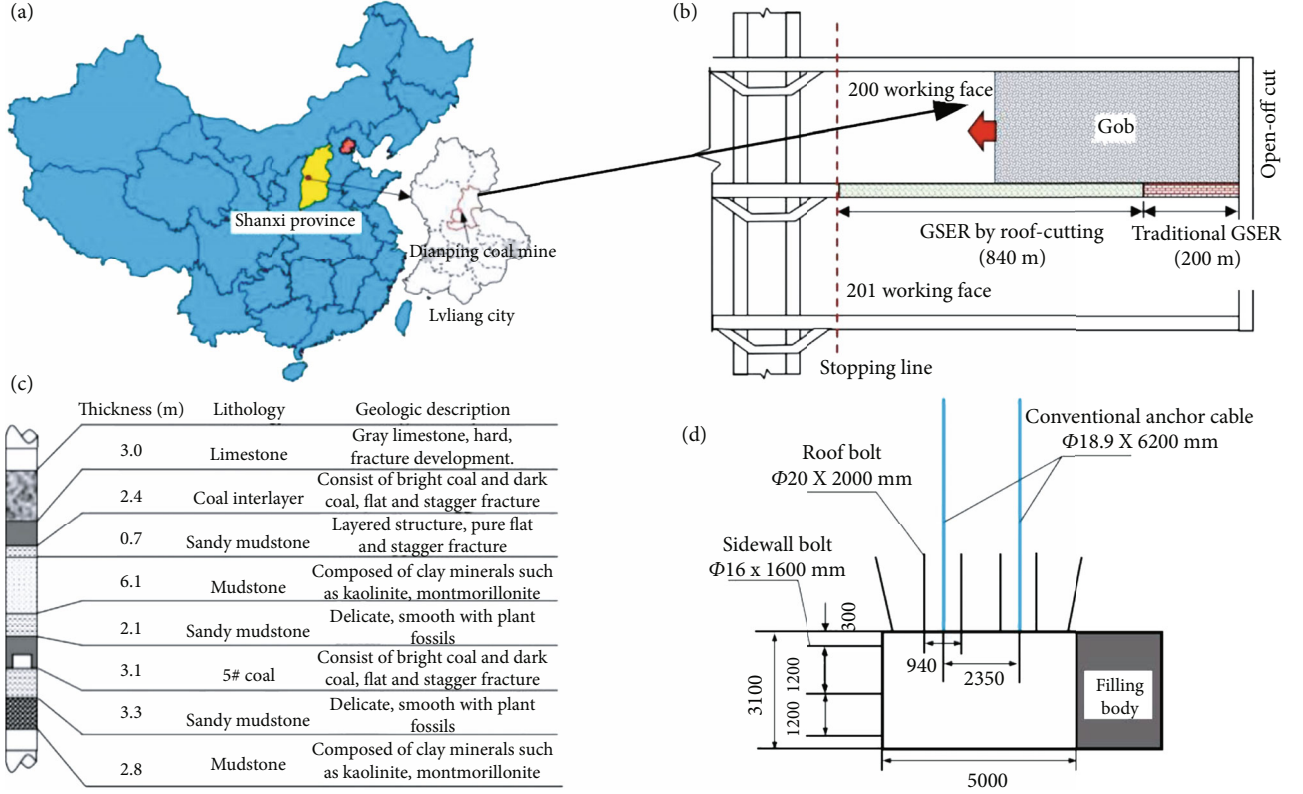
Project profile: (a) geographical position, (b) layout of the working face, (c) histogram of the roof and floor strata, and (d) original support section.
